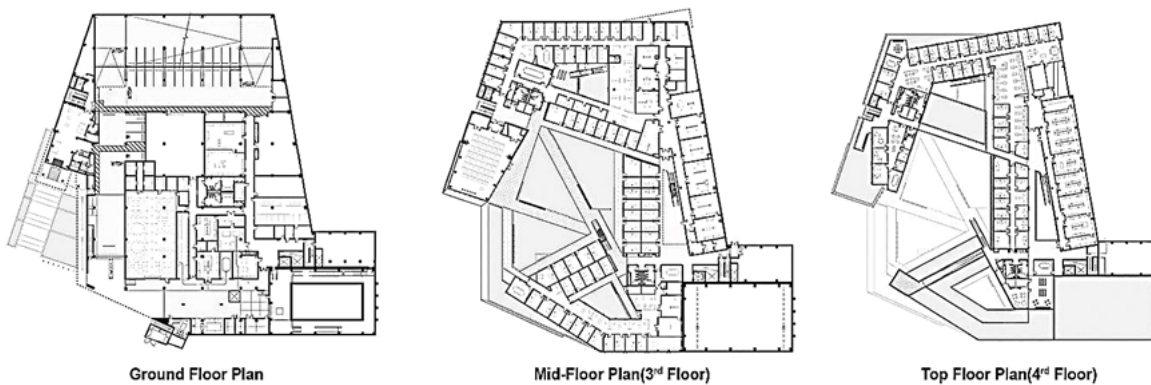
First Floor, Third Floor Plan and Fourth Floor Plan of NOAA Southwest Fisheries Science Center, Redrawn based on images retrieved from archdaily.com
